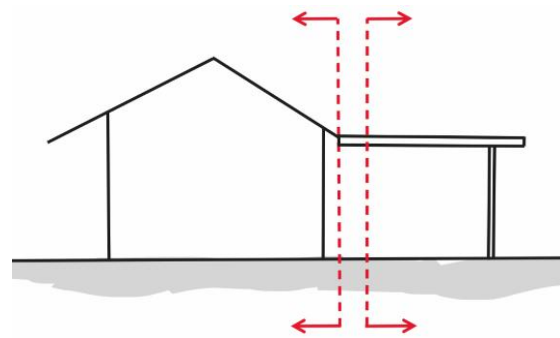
Wide roof overhangs should be avoided. (Source: Authors).
